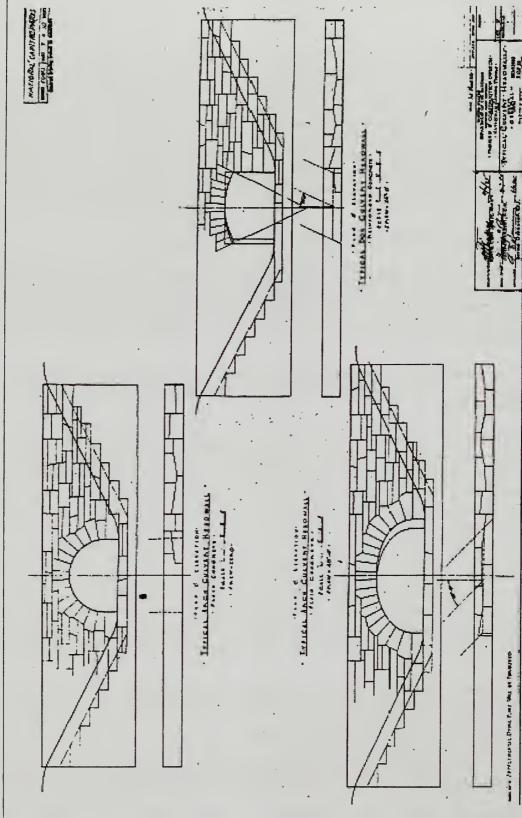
Typical Culvert Headwalls, June 2, 1945 (National Capital Parks-East, Drawing #883-41900).
